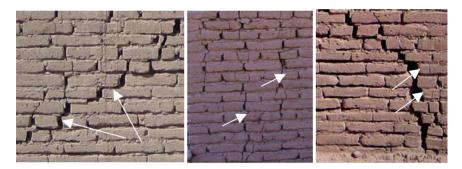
Friction (left), tension (middle) and beginning of shear-compression failure (right, crashing) of the adobe-masonry.
